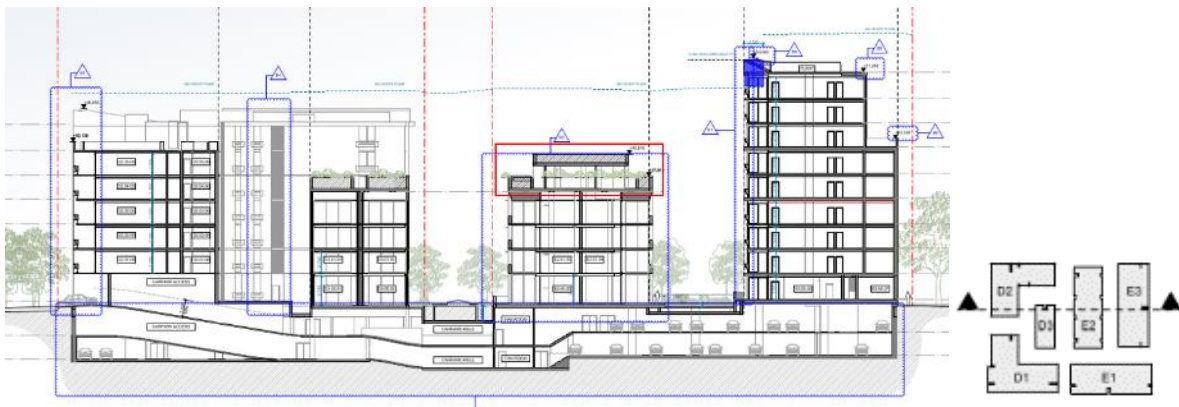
East-west section through the site with the additional storey to Building E2 outlined in red
